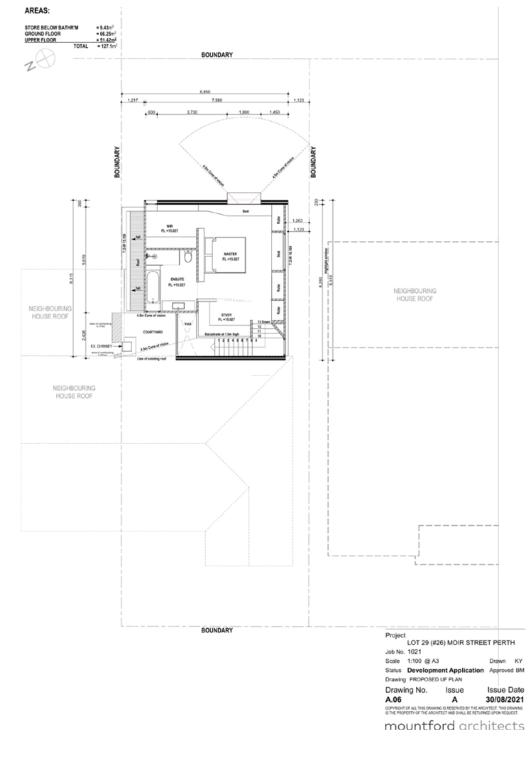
Courtesy: PROPOSED UPPER FLOOR PLAN Mountford Architects
